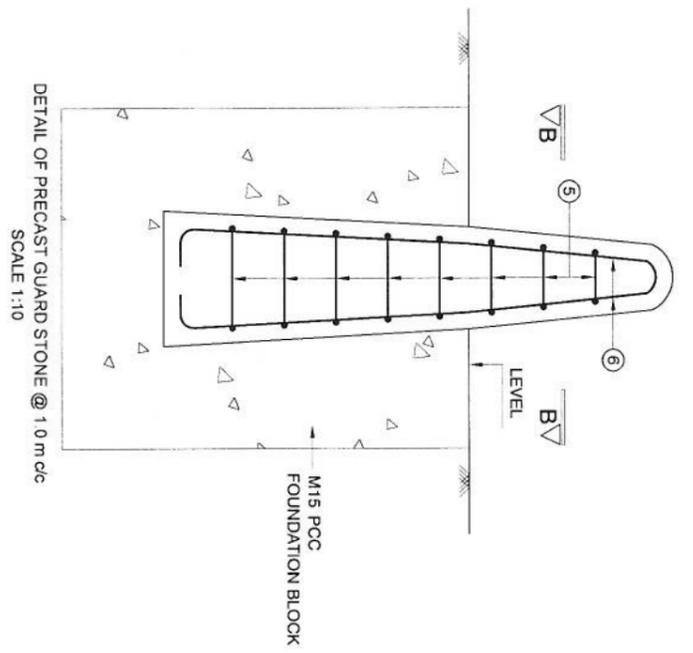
DETAIL OF PRECAST GUARD STONE @ 1.0 m c/c
